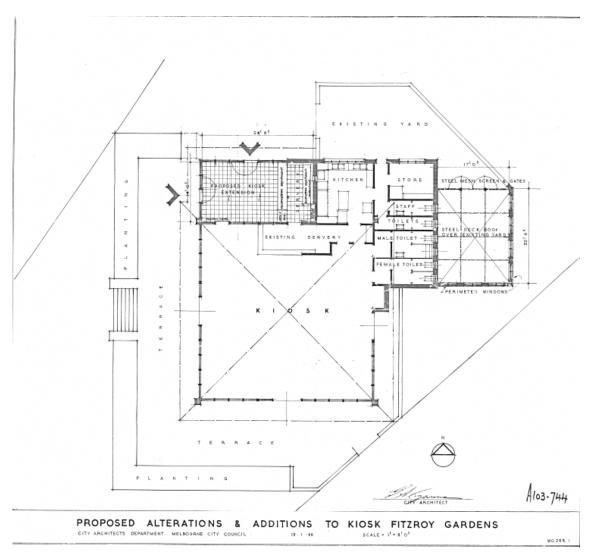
Drawings of the proposed (and completed) additions to the Pavilion, 1966Source: City Architects Department, Proposed Alterations & Additions to Kiosk FitzroyGardens for Melbourne City Council, Drawing No. WG 295.1, 13 January 1966, provided byCity of Melbourne
